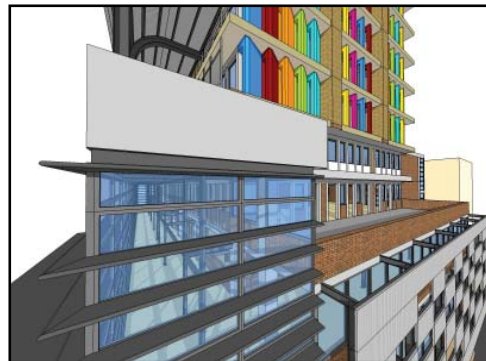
Glazed facade wraps around to western side with the corrugated western screening continuing on the western facade
